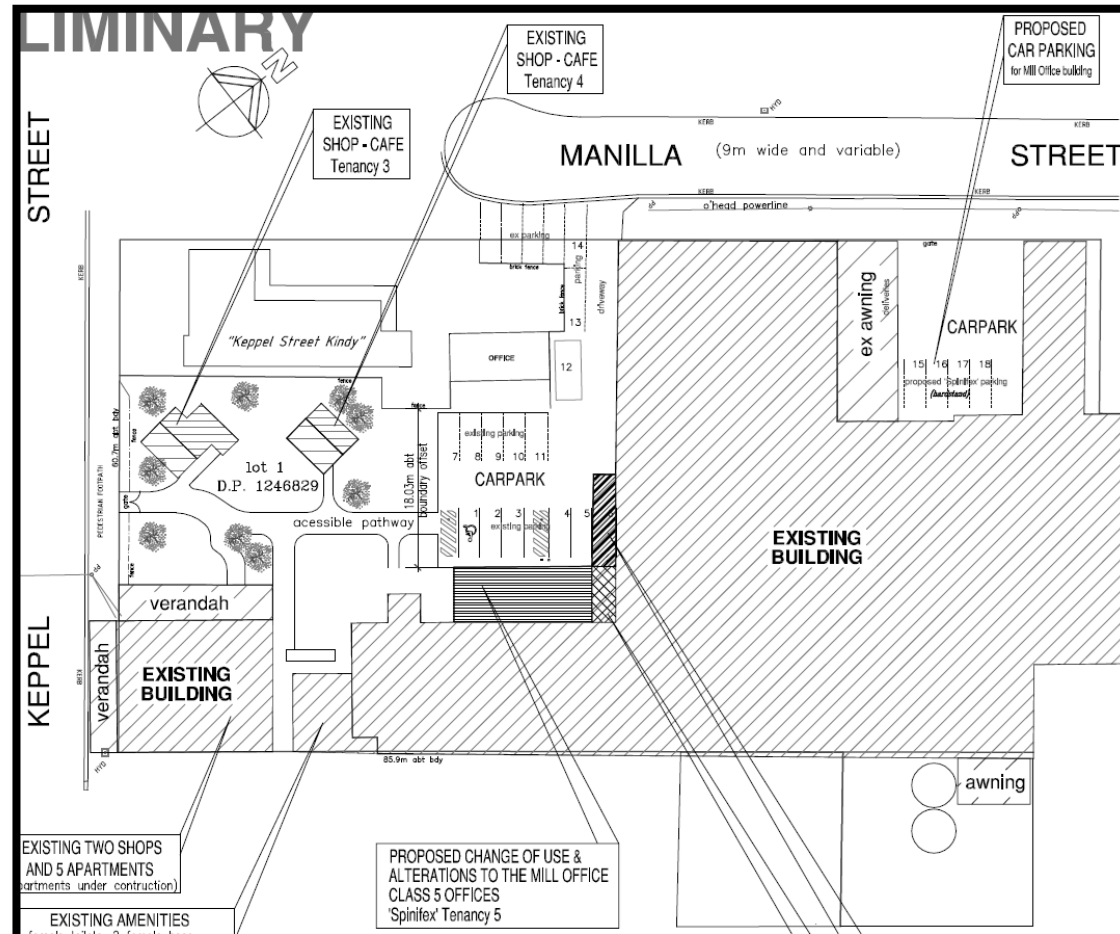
Site Plan and Carparking Approved under Development Consent No. 2020/336 – Use of Existing Change-of-Use to Office – Lot 11 DP 1266801
